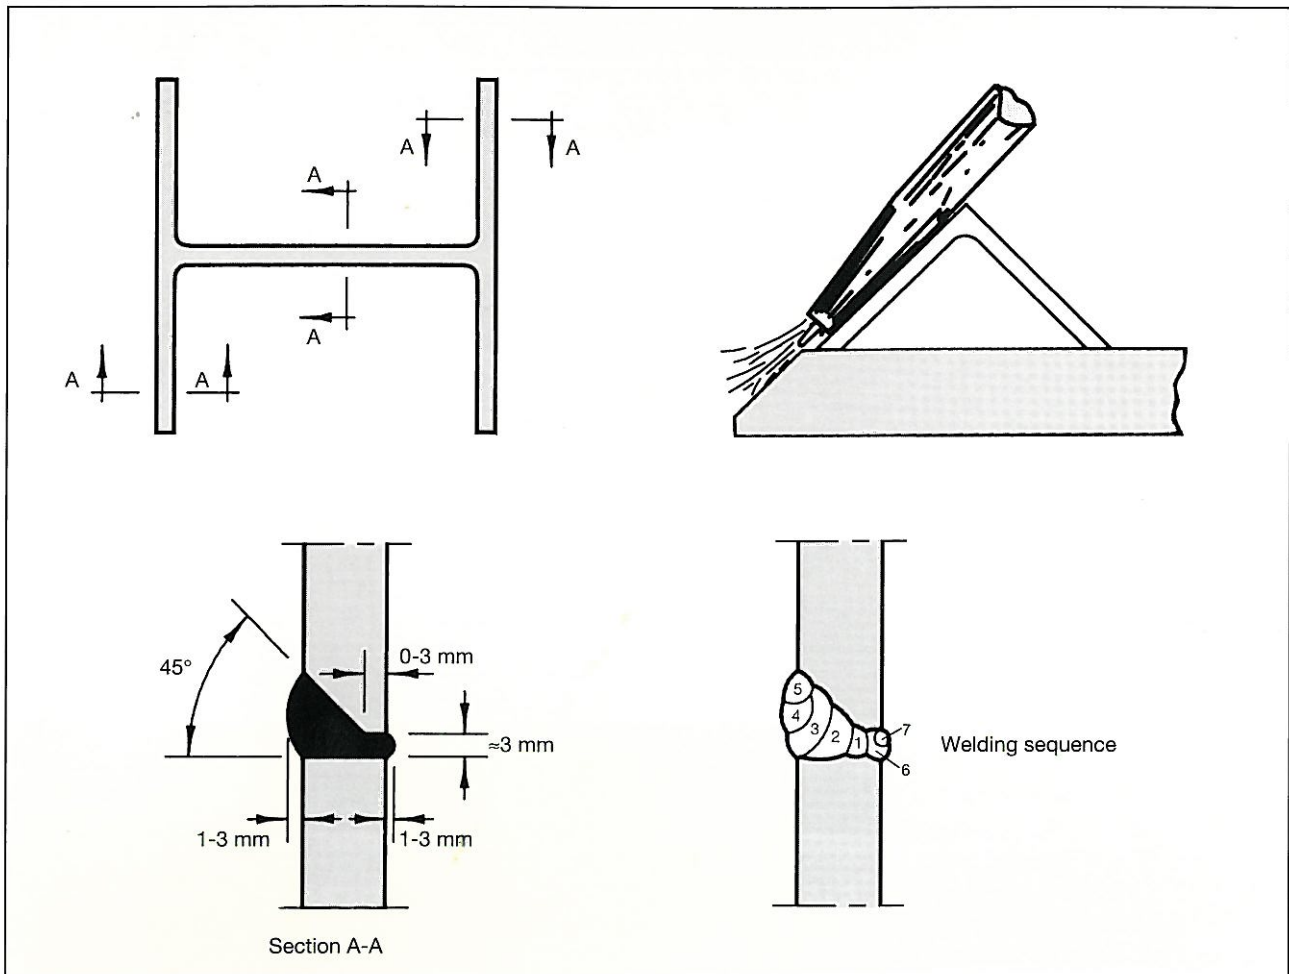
Typical details for welds performed in vertical position of the pile
